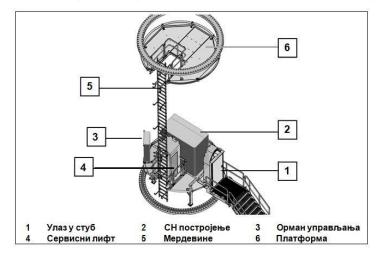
Overview of the lower section of the tubular steel column (column plates not shown)
